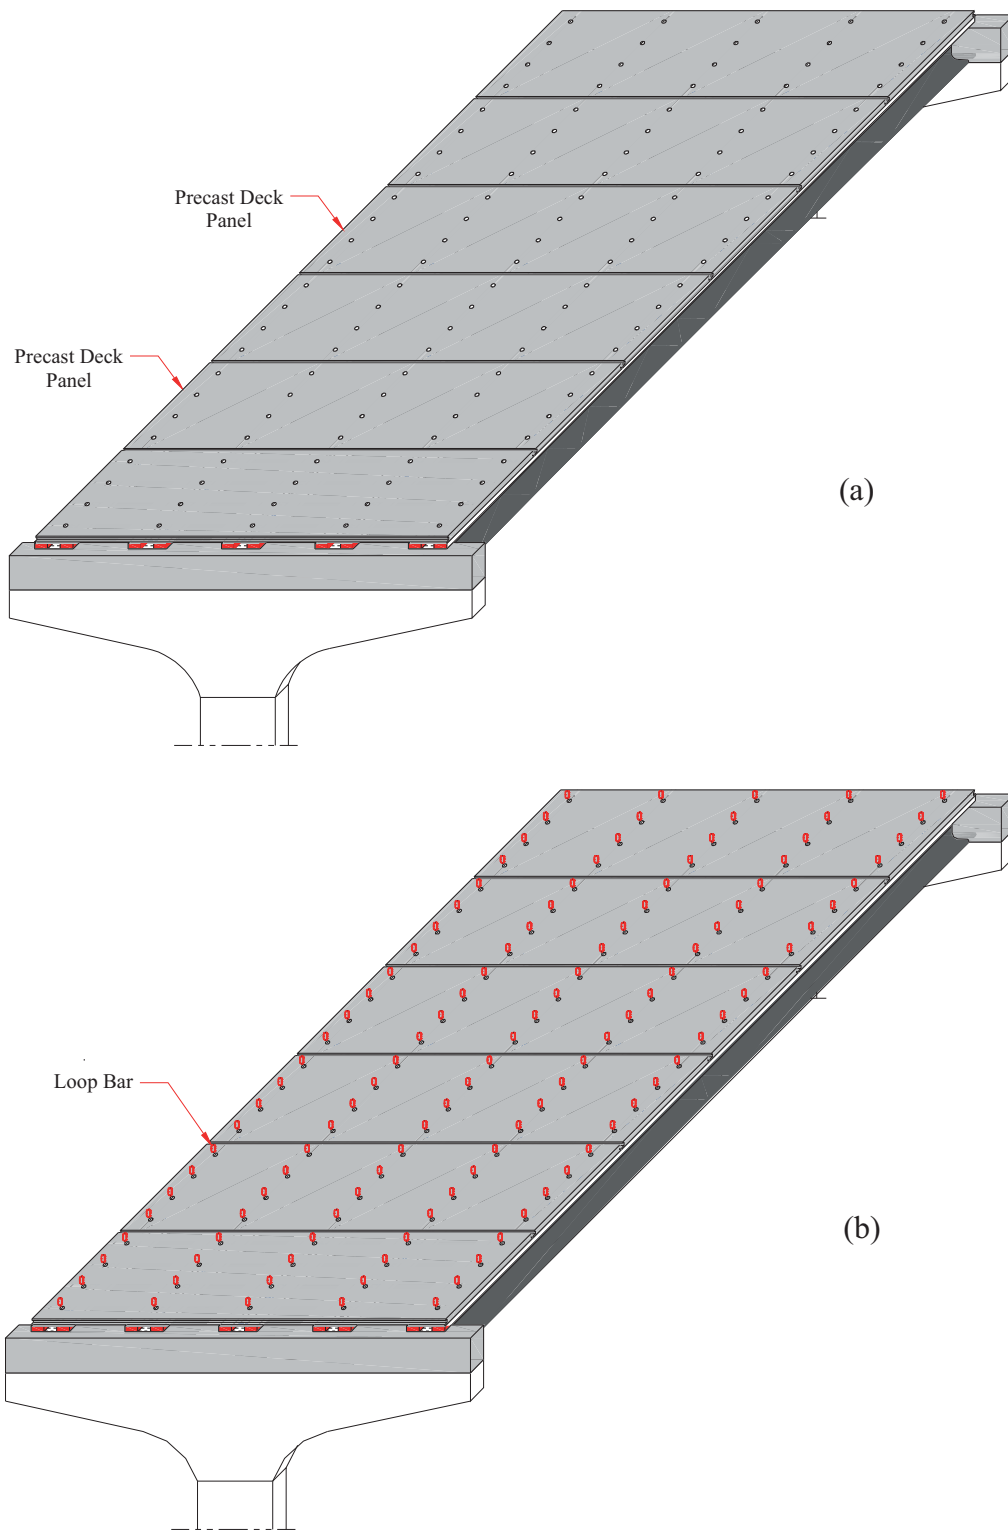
Construction Sequence of the Proposed Precast Concrete Deck-to-Concrete Girder Connection Using UHPC
